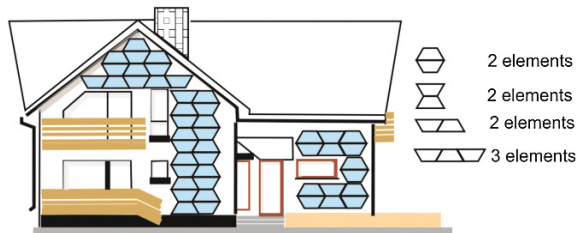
Horizontally disposed array units with trapeze elements on the façade of a residential house
